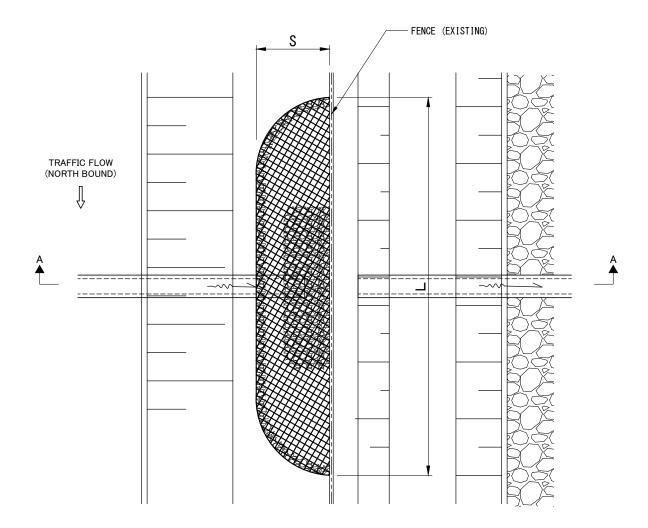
DETAILS OF DRAINAGE INLET/OUTLET PROTECTION
